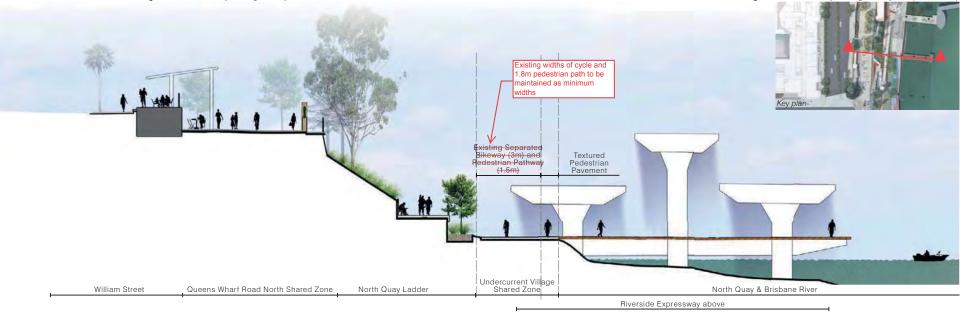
Existing Bikeway Typical Sectional Elevation (Not to scale)
